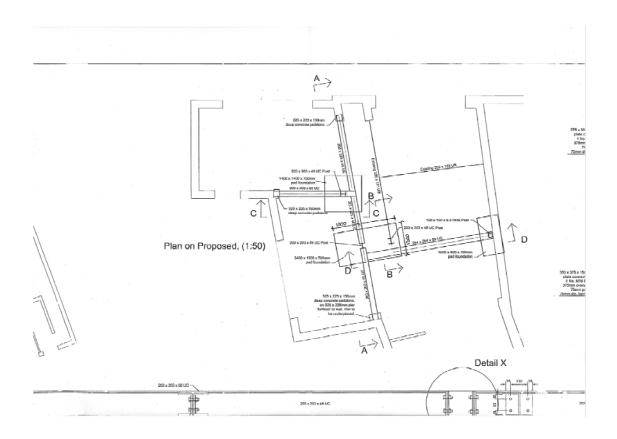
Plan of proposed groundworks at 47-51, High Street, Daventry.
